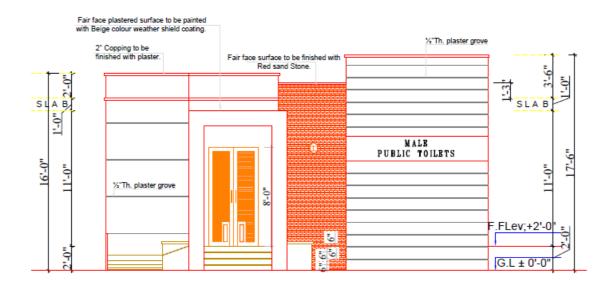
3D Elevation of Toilet Blocks at Daud Khel
